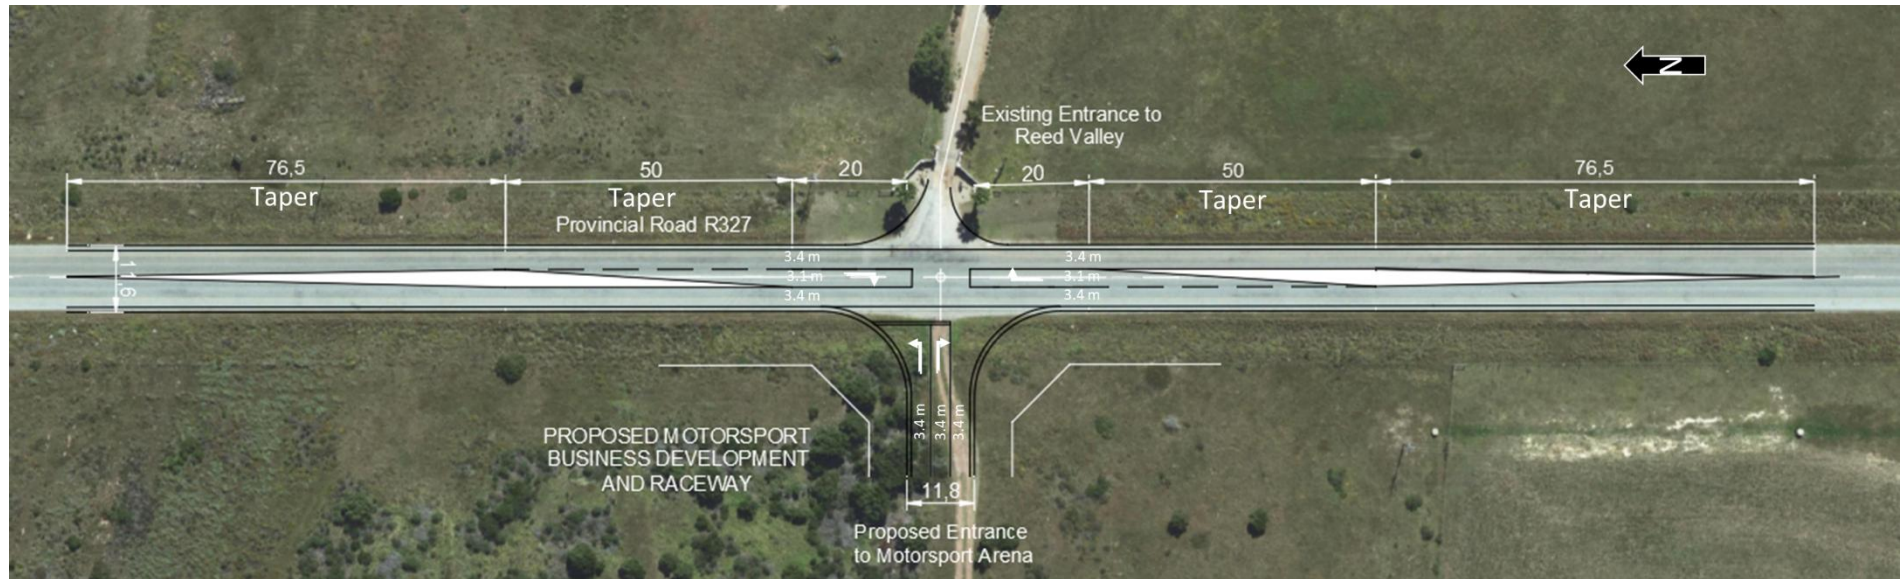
Proposed Primary Access Intersection Layout on Provincial Road R327
